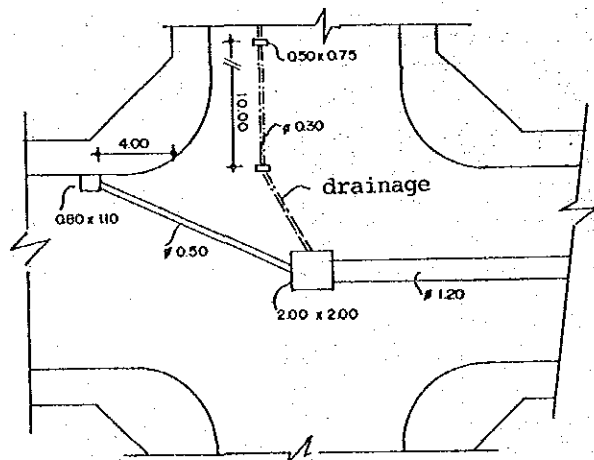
PLAN OF DRAINAGE FACILITY
